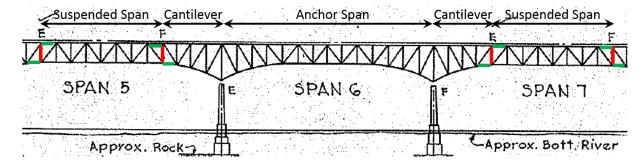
Schematic of Typical Cantilevered Deck Truss Assembly
